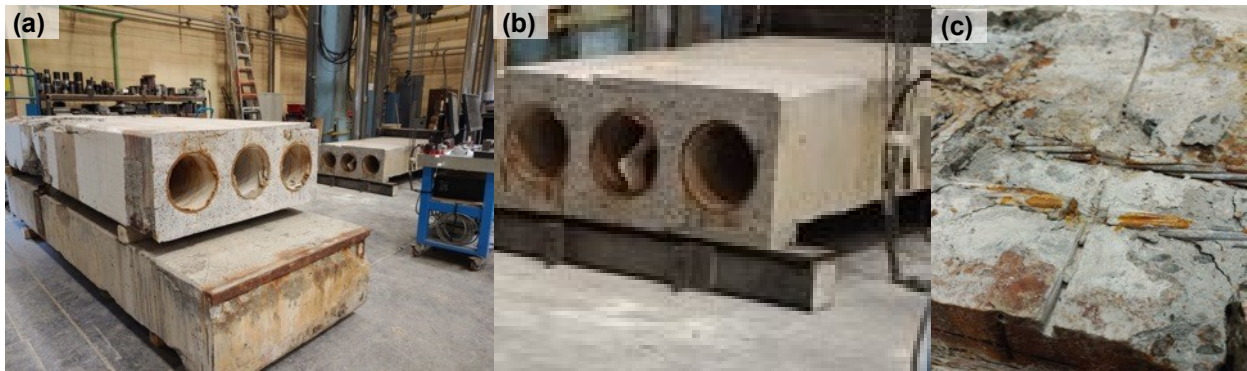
16: (a) Girder LD-1, (b) Girder LD-1.5, and (c) Cut strands for Girder ID for induced deterioration.
